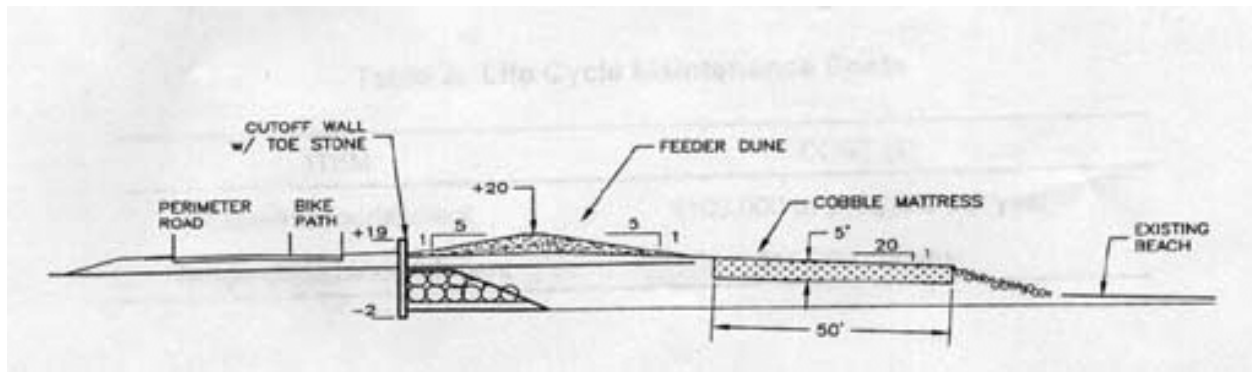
Plan View of Restoration Plan for Surfer's Point.
